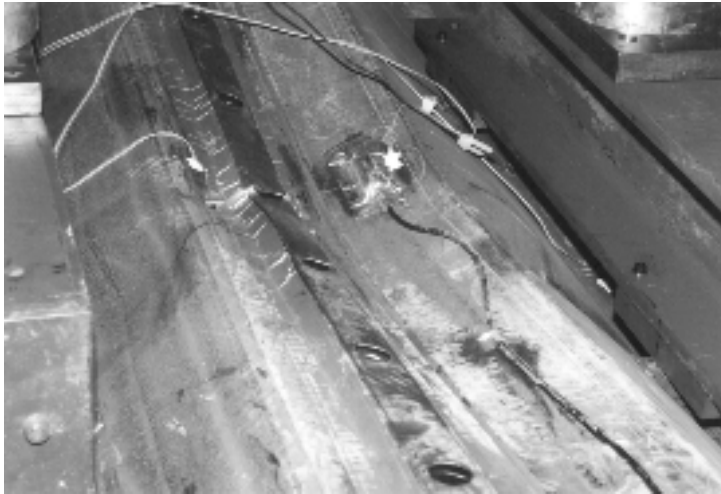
Epoxy protection strip subjected to large deformations
